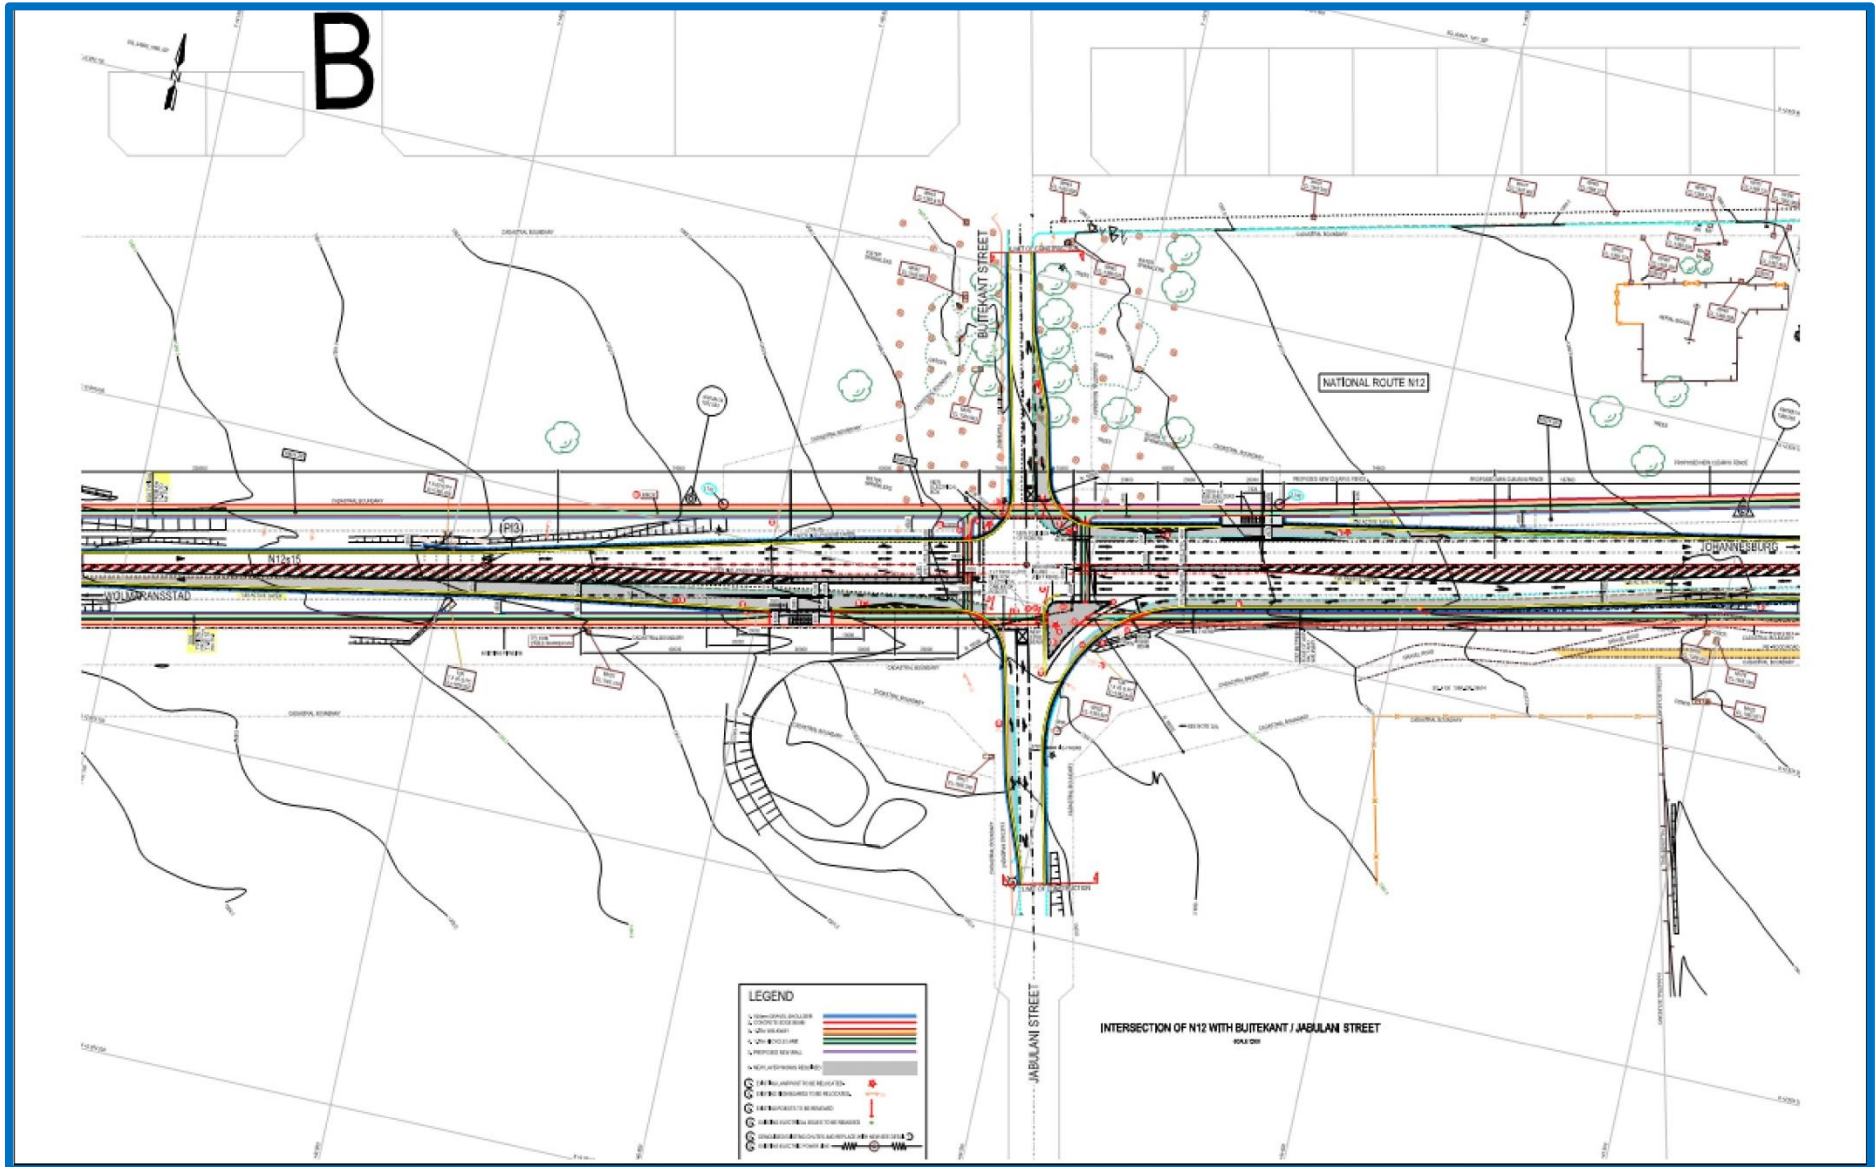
Road N12 and Buitekant Street intersection (Point 2) upgrade by SANRAL.
